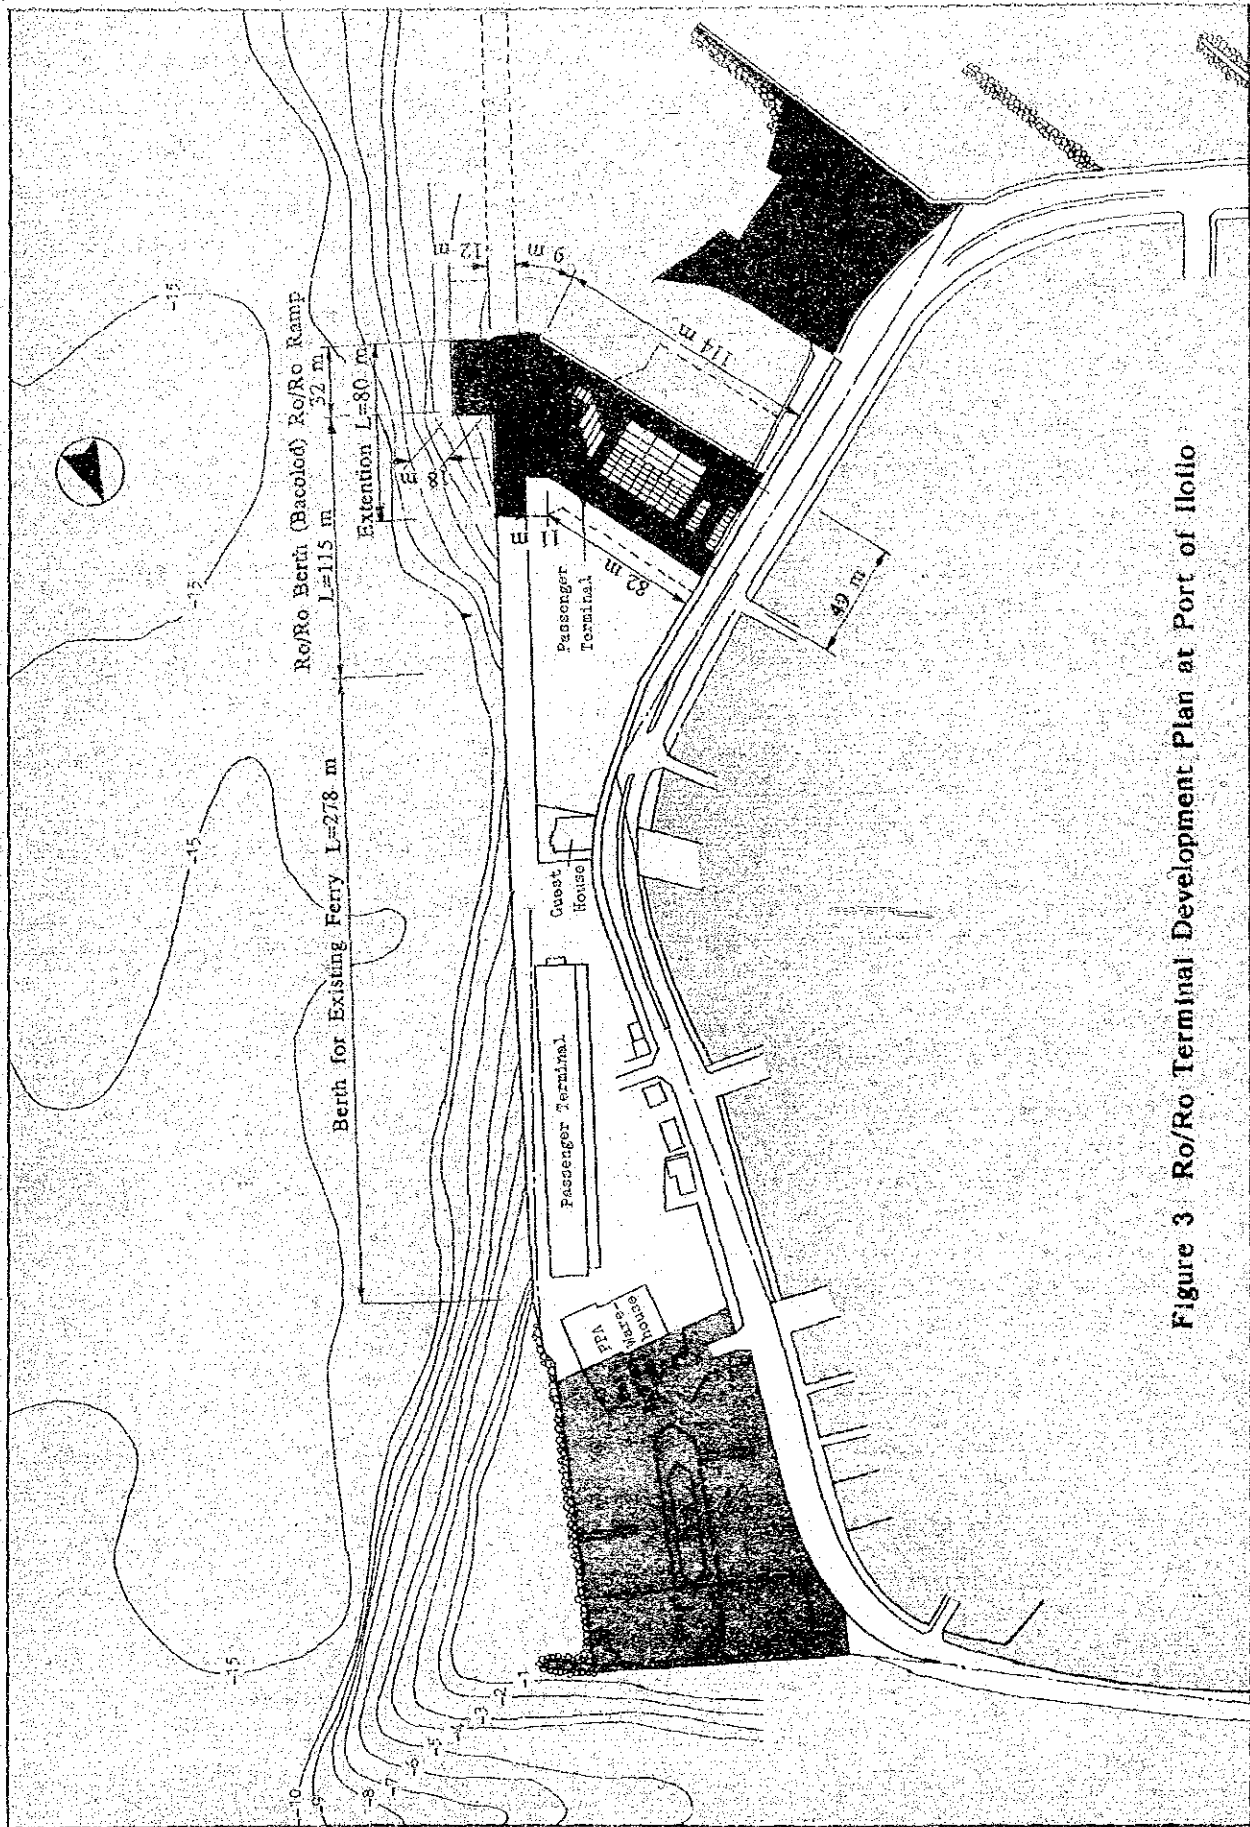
Ro/Ro Terminal Development Plan at Port of Iloilo
